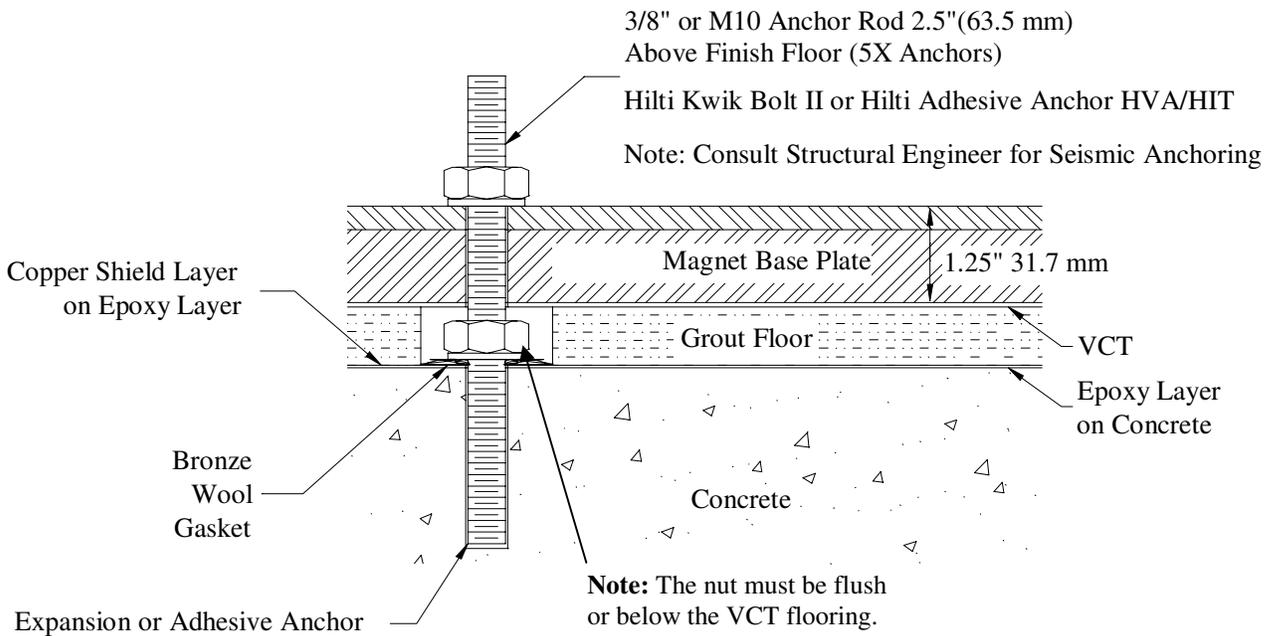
Typical Floor Prep Detail for Hilti Anchor
